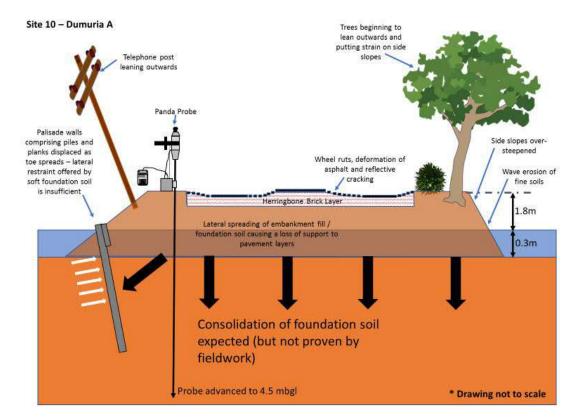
Site 10 Dumuria A Observational Ground Model
